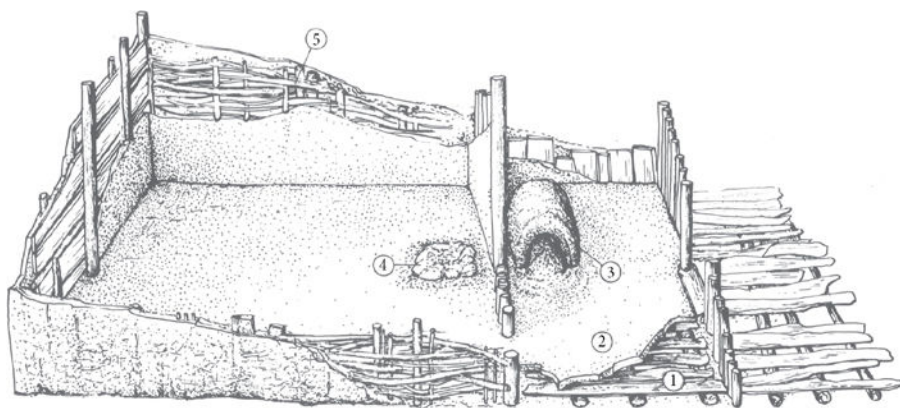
Internal division of a wetland Neolithic house at Ehrenstein (Schussenried culture), Germany. 1) Wooden floor directly constructed on the ground; 2) Stratum of clay laid on the wooden floor; 3) Oven; 4) Fireplace; 5) Wattle wall daubed with clay (Modified from Schlichtherle and Wahlster 1986).
